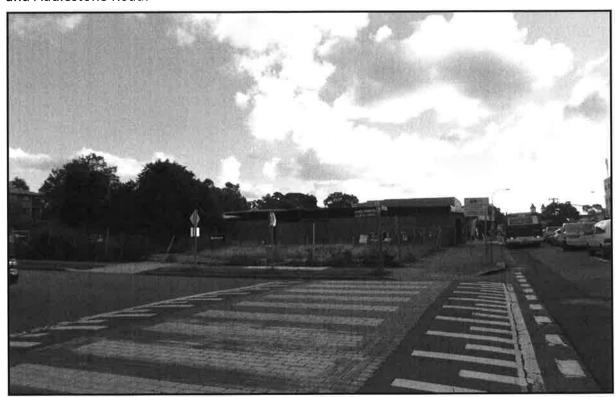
Showing the existing commercial building as viewed from the intersection of Merrylands Road and Burford Street
